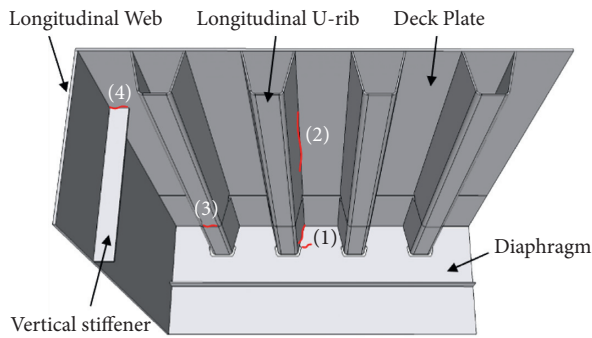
Sketch of typical fatigue cracks of OSD.
